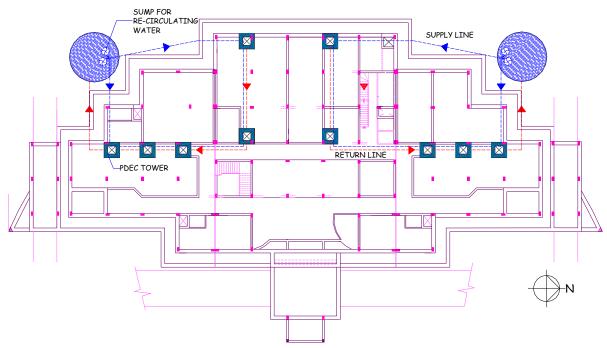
Layout plan of I.G.P. Complex, Gulbarga
